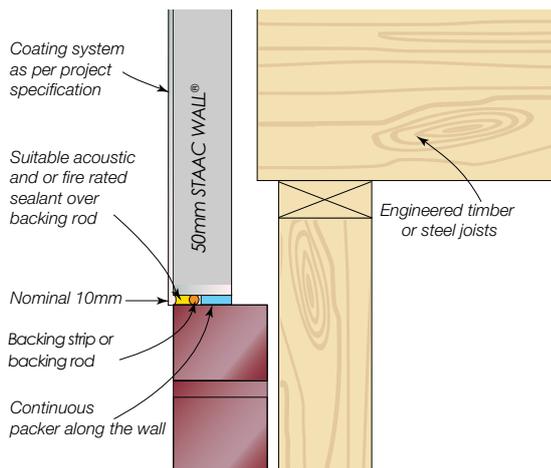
Typical horizontal control joint – engineered timber or steel frame (Achieves FRL 90/90/90 when installed as part of the wall system.)
